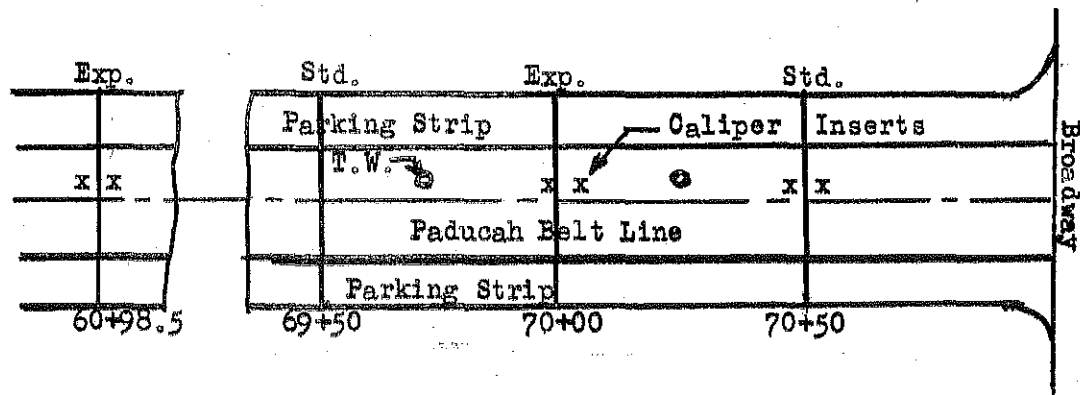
A- Layout sketch of pavement section showing locations of joints under investigation and the positions of Caliper Inserts and Thermometer Wells (T.W.).
